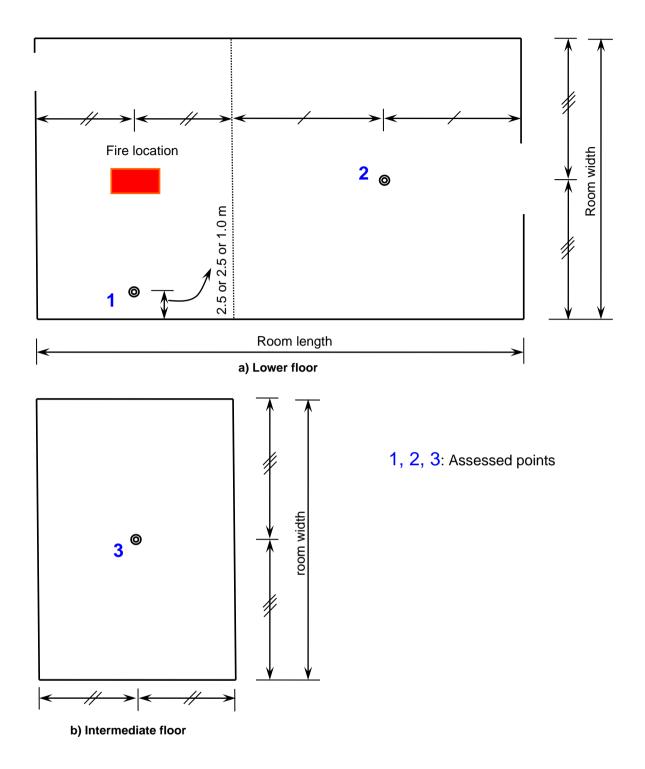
Schematic of assessed point locations in FDS modelling with a fire located under intermediate floor (Plan view)
